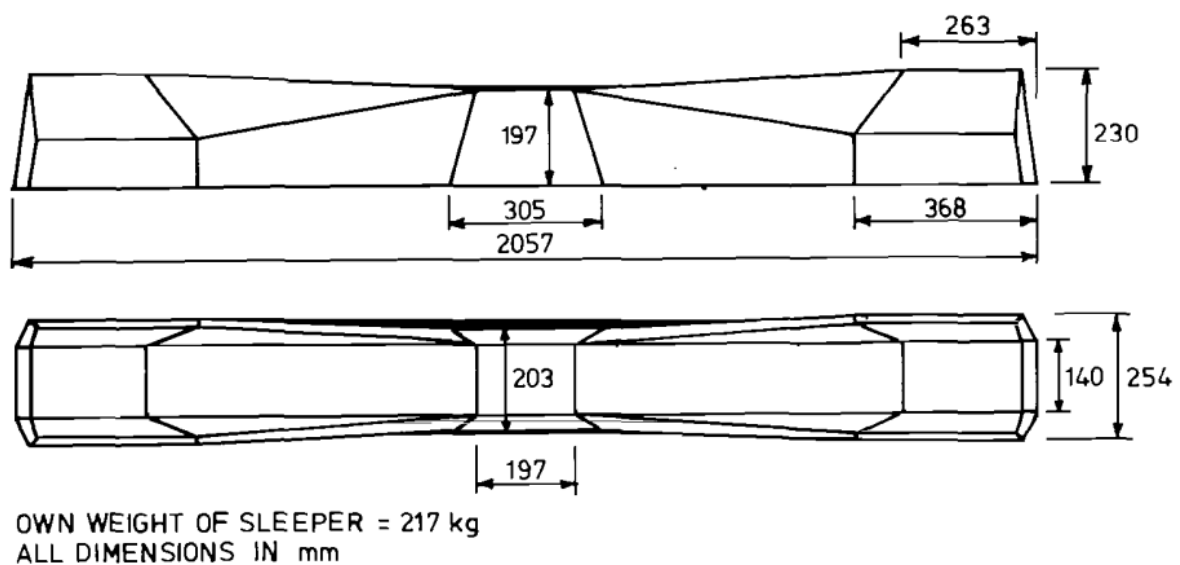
Typical design of concrete sleepers used in South African mainlines (Dunaiski, 1985)
